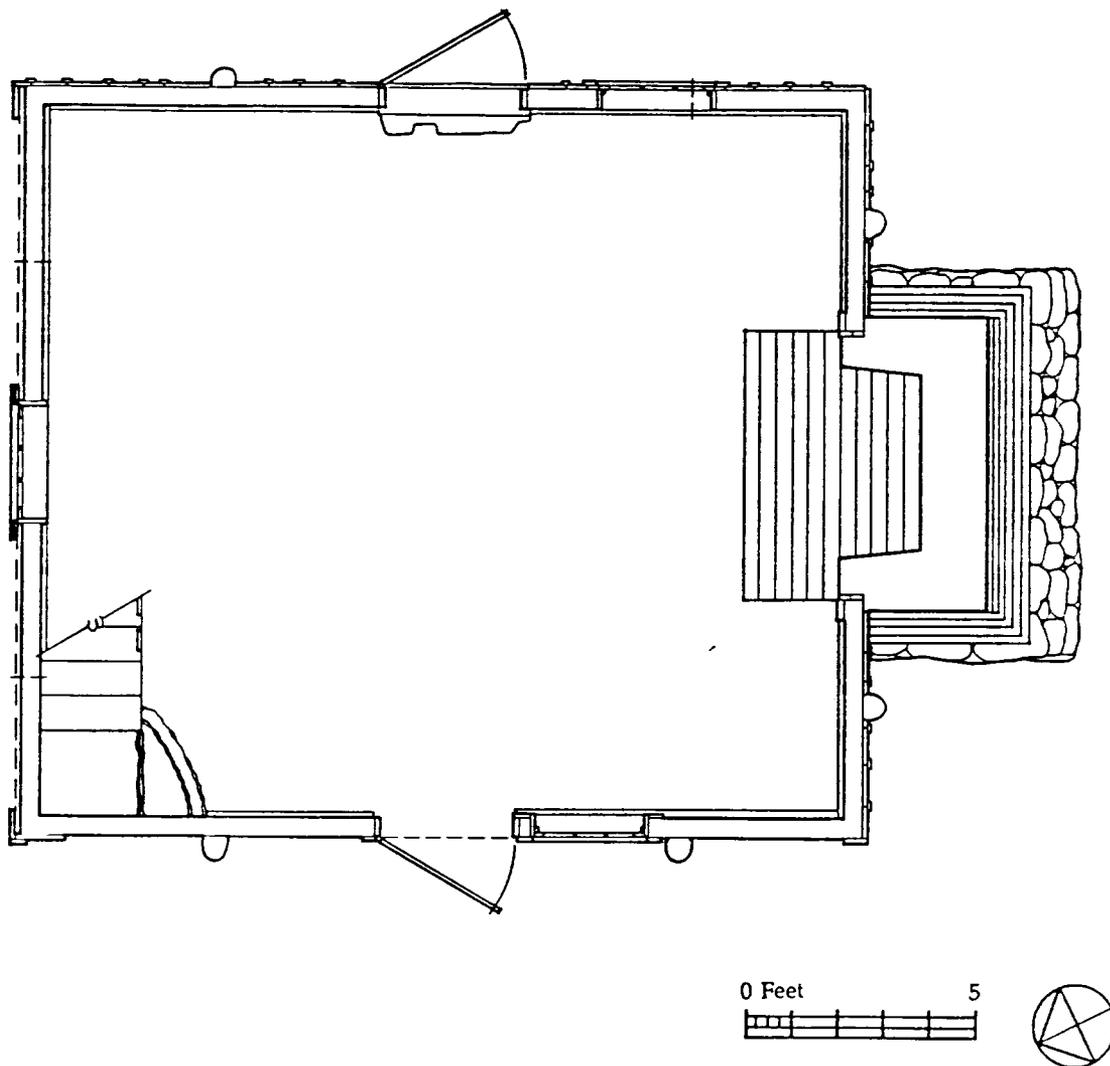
First-floor plan. This and subsequent drawings are by Jeffrey Bostetter, Colonial Williamsburg Foundation.
